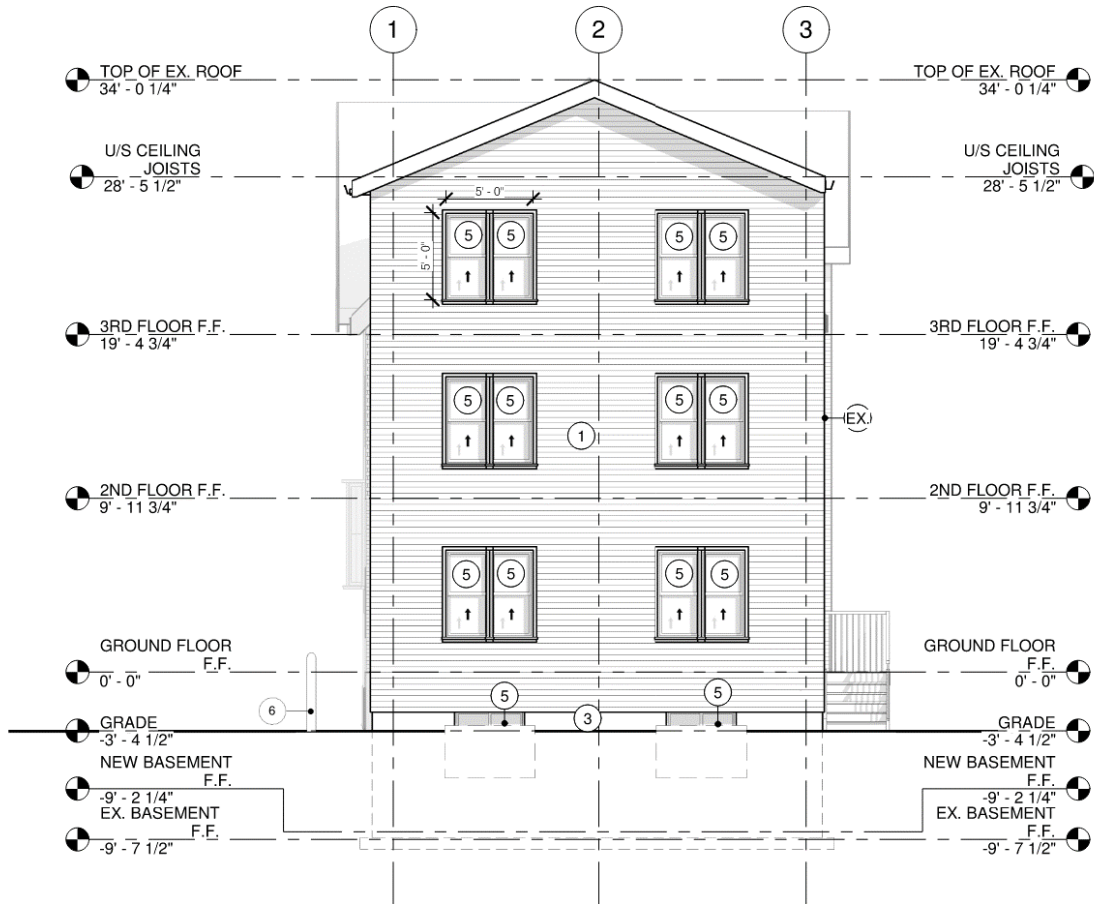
East (side) elevation of the existing dwelling with the proposed addition.
